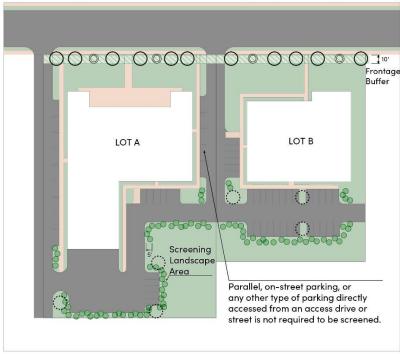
(C): Site Planning Landscape and Parking Requirements
